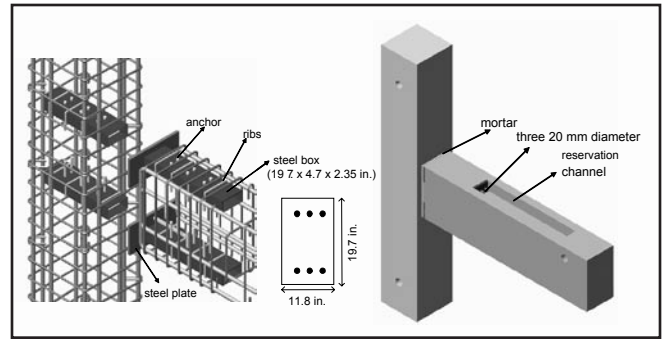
Connection detail and overall view of modified bolted connection. Note: 1 in. = 25.4 mm.
